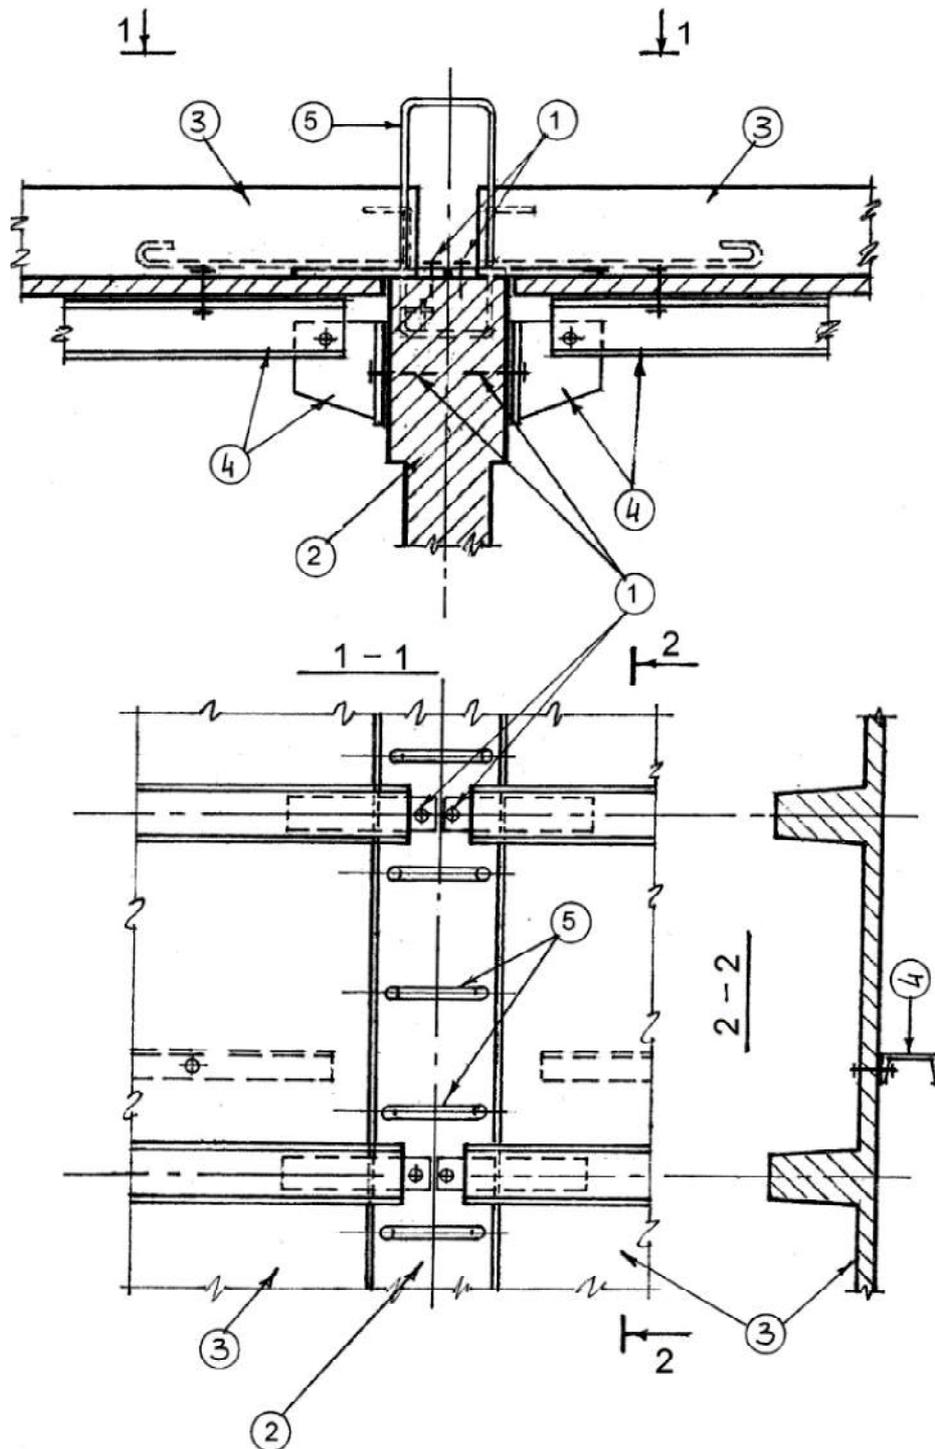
Support scheme for a prefabricated precast concrete formwork (3) on an internal wall panel (2)
